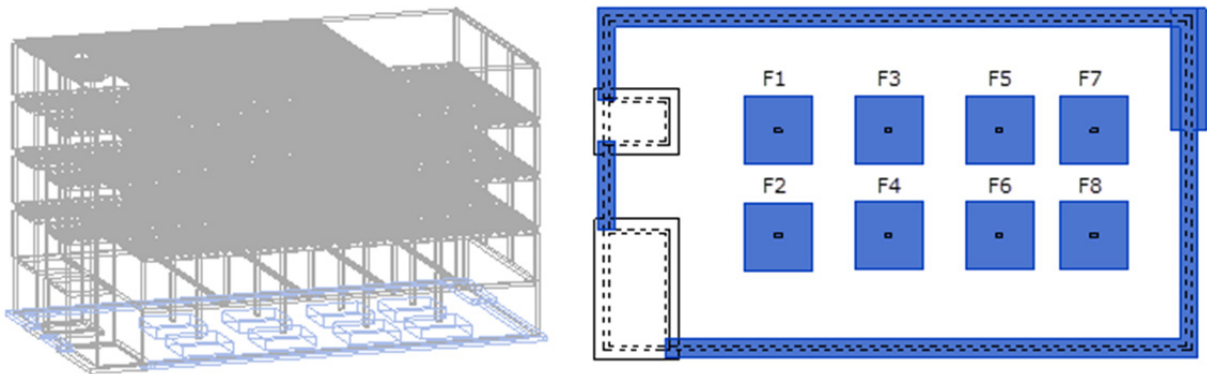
Reduced size of foundations due to lighter structure with additional support underneath the steel cross taking wind loads on the east façade.
